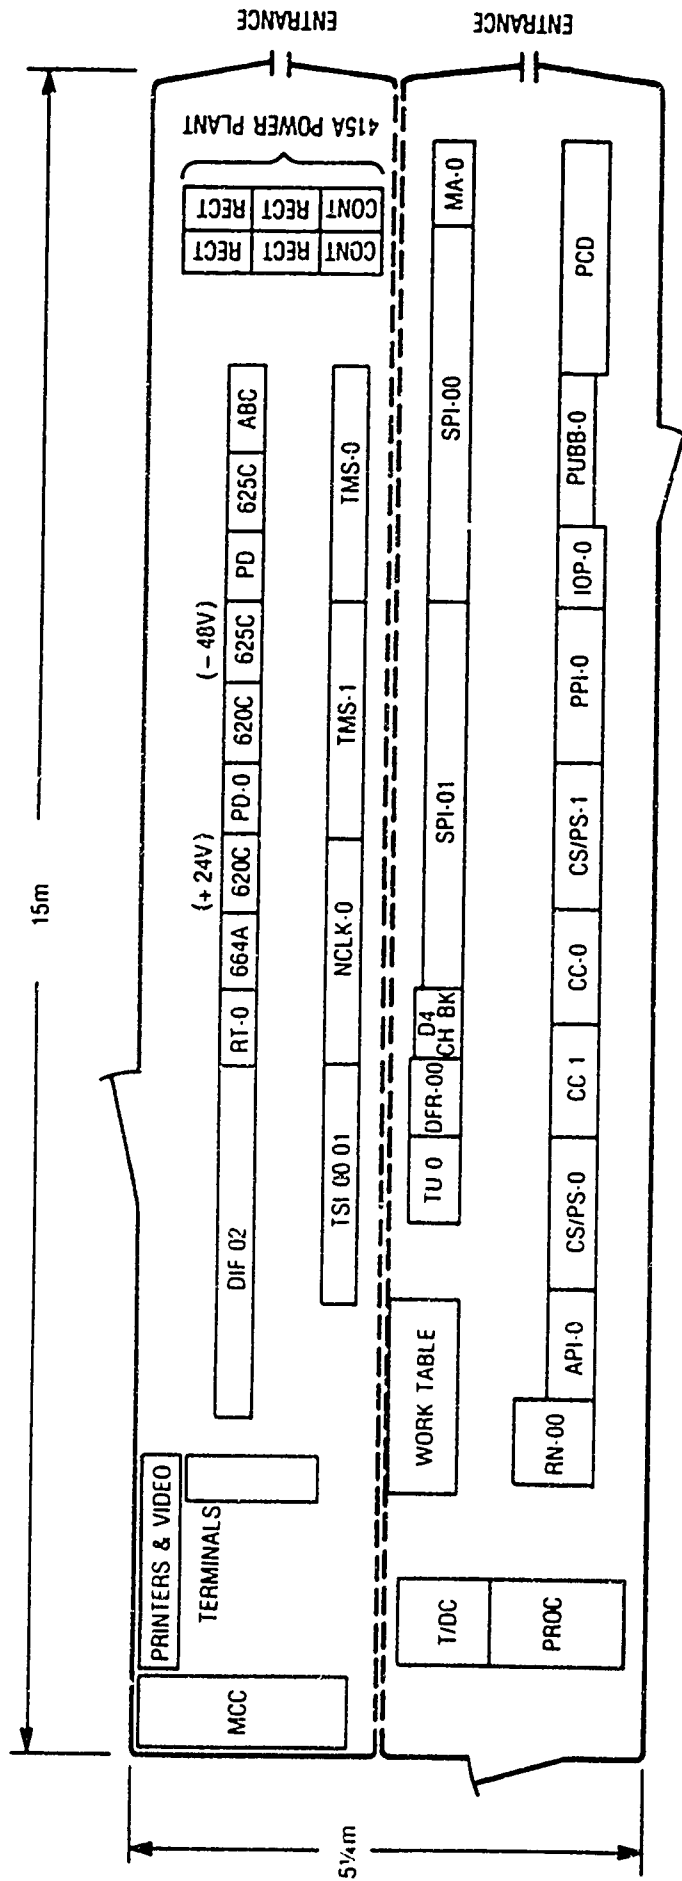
Floor plan of the 4 ESS Switch test trailers.
